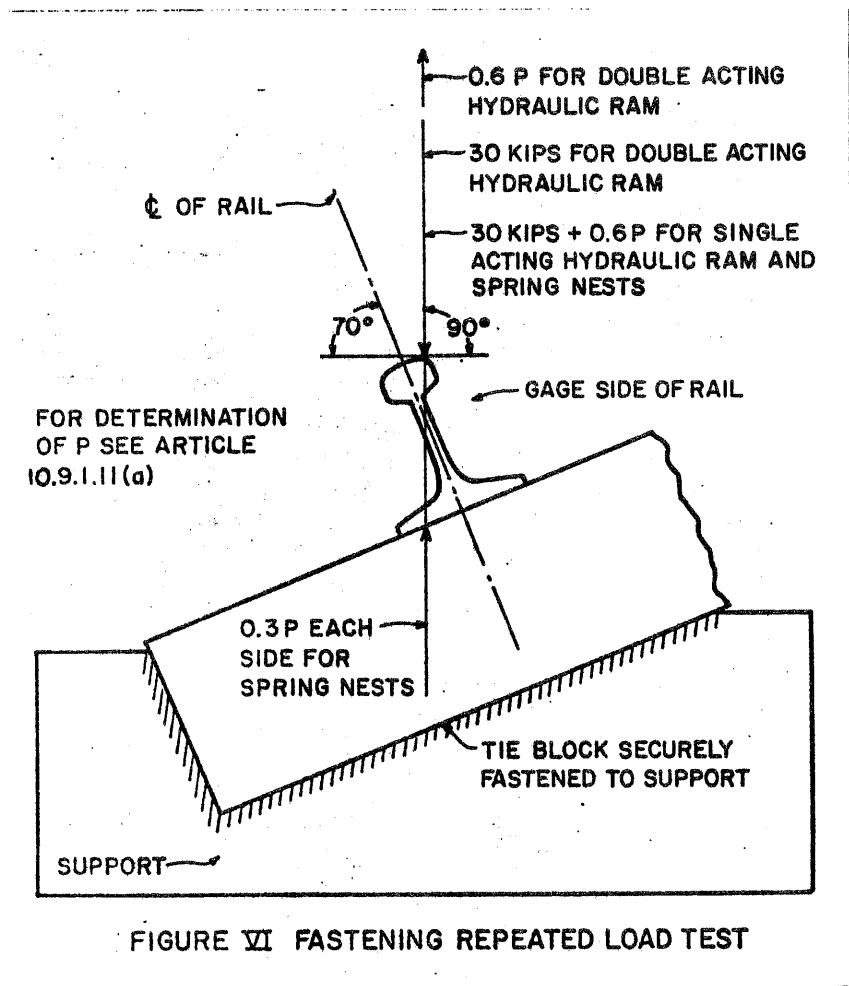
Showing typical set-up for fastener repeated load test as taken from AREA Bulletin 655.
